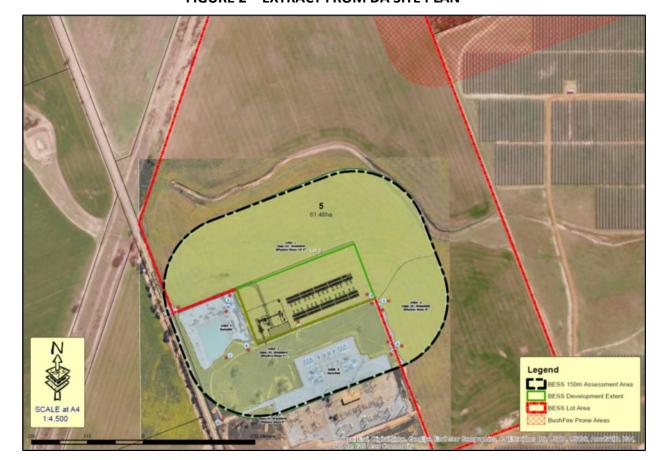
EXTRACT FROM DA SITE PLAN
